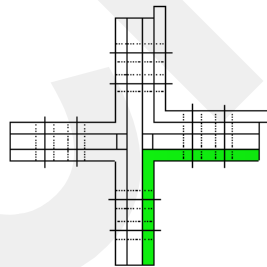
Bending on lower main member 2 (Specimen-2)
